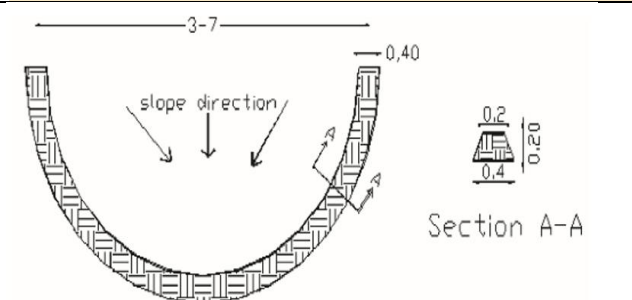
Cross-section of oval-shaped bund (0.4 m base width, 0.2 m top width, 0.20 m height).
